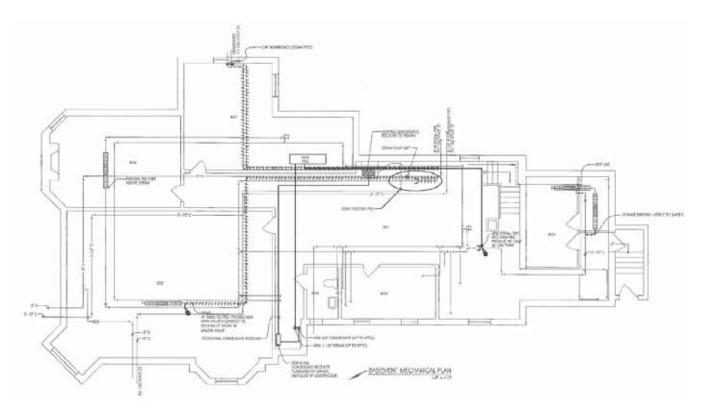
Basement plan from September 2010 Mechanical Renovation plans, Sheet M-1 (N.T.S.)
